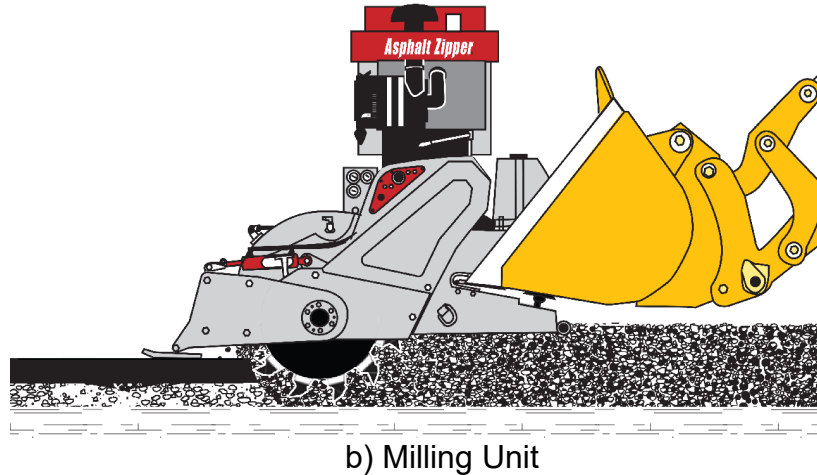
Small Milling Unit Mounted on Front Loader (Courtesy of Asphalt Zipper, Inc.)
